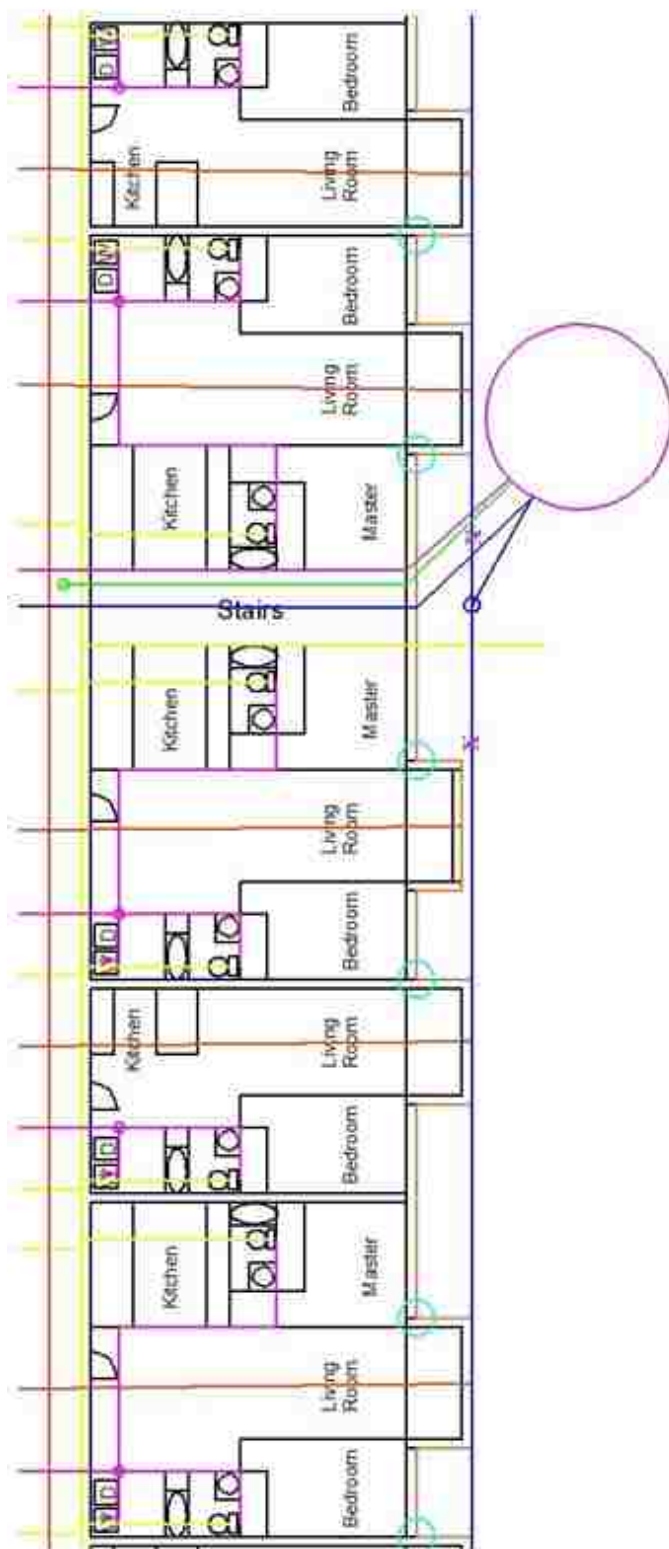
Example of Plumbing Layout for Apartment Rainwater Harvesting and Indoor Use. Rainwater is harvested from the roof and stored in the cistern. The water is used inside for non-potable uses such as toilet flushing and laundry.
